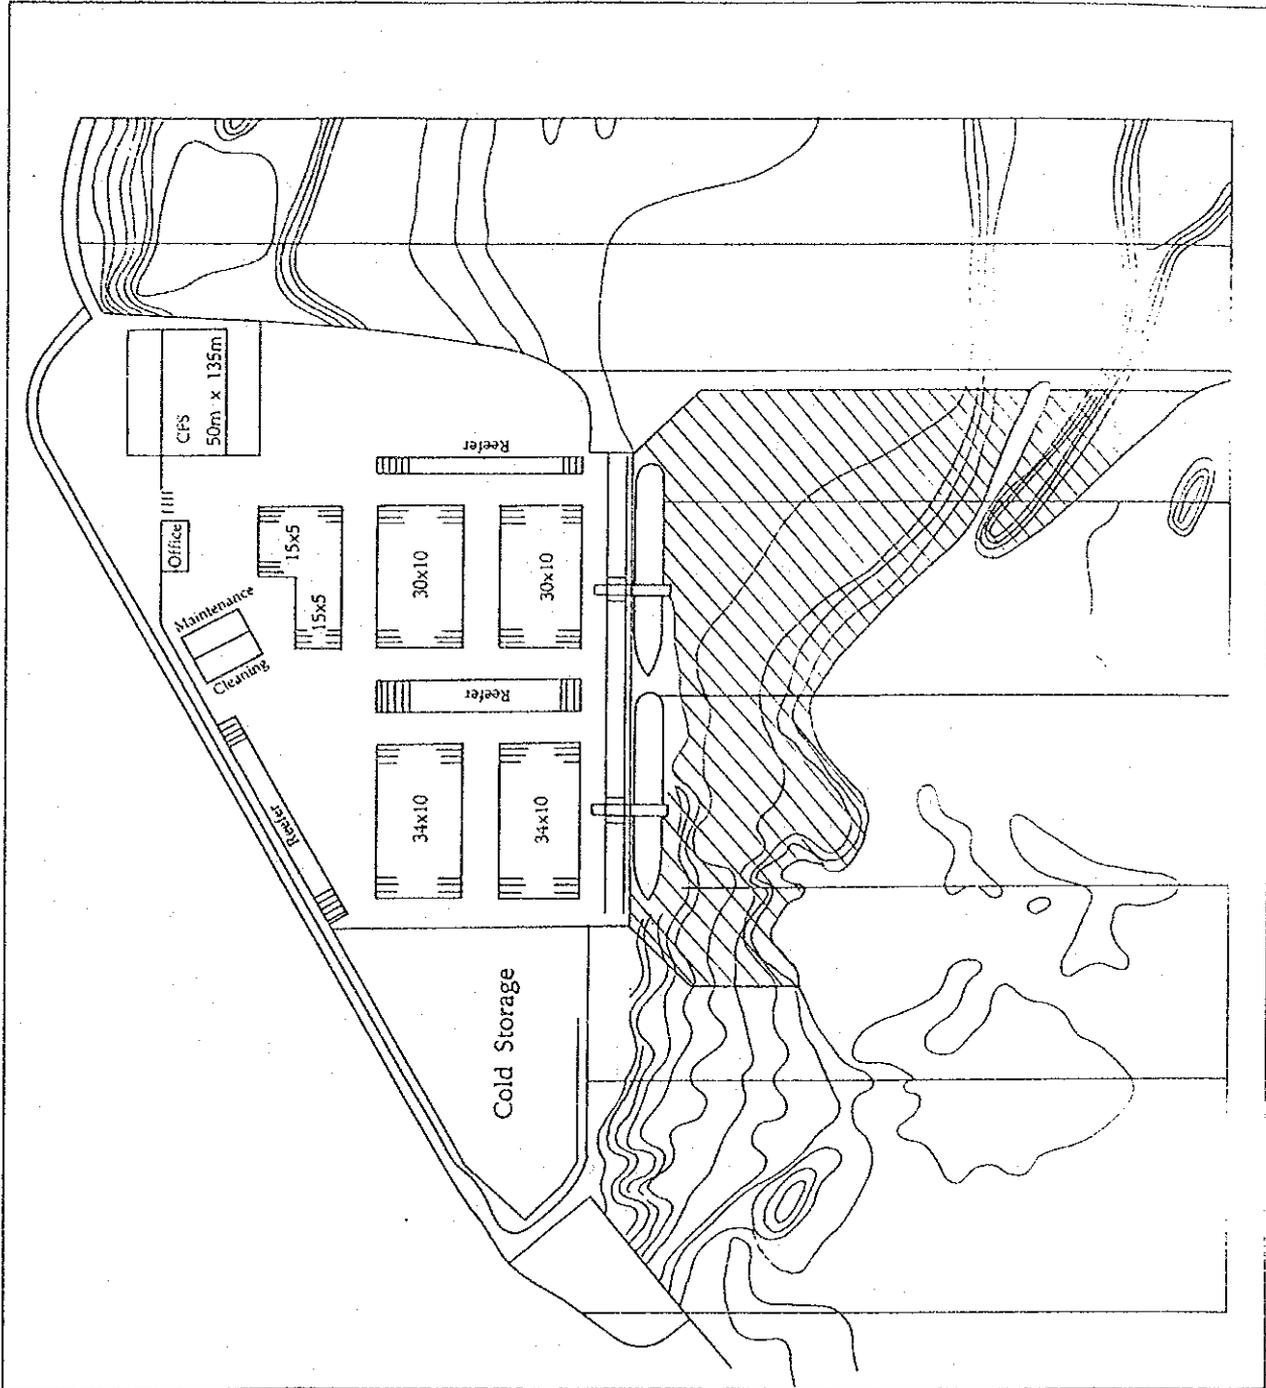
Layout Plan of Unit Cargo Terminal for Short term Plan
